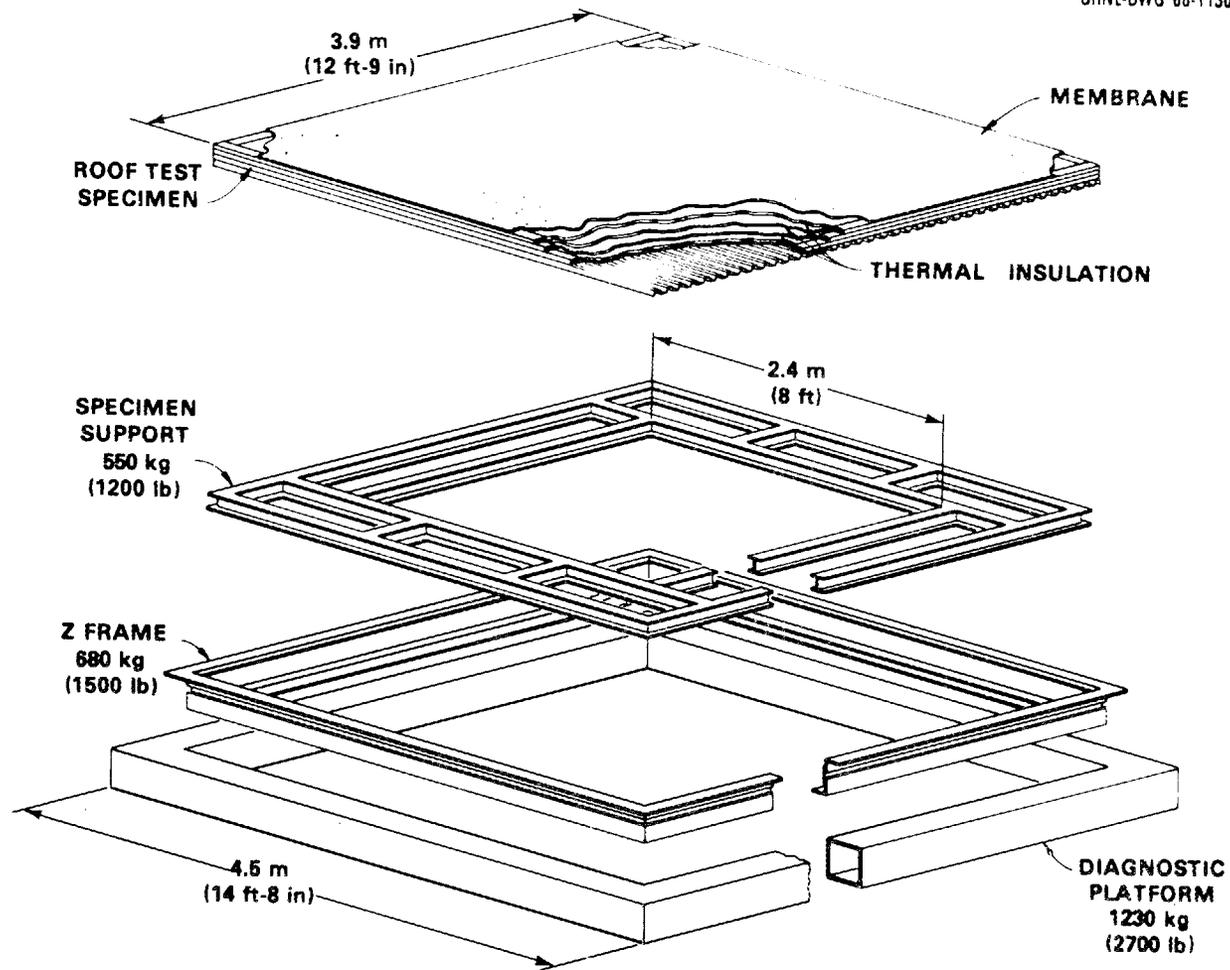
Exploded view of a guarded hot-box roof test specimen.
